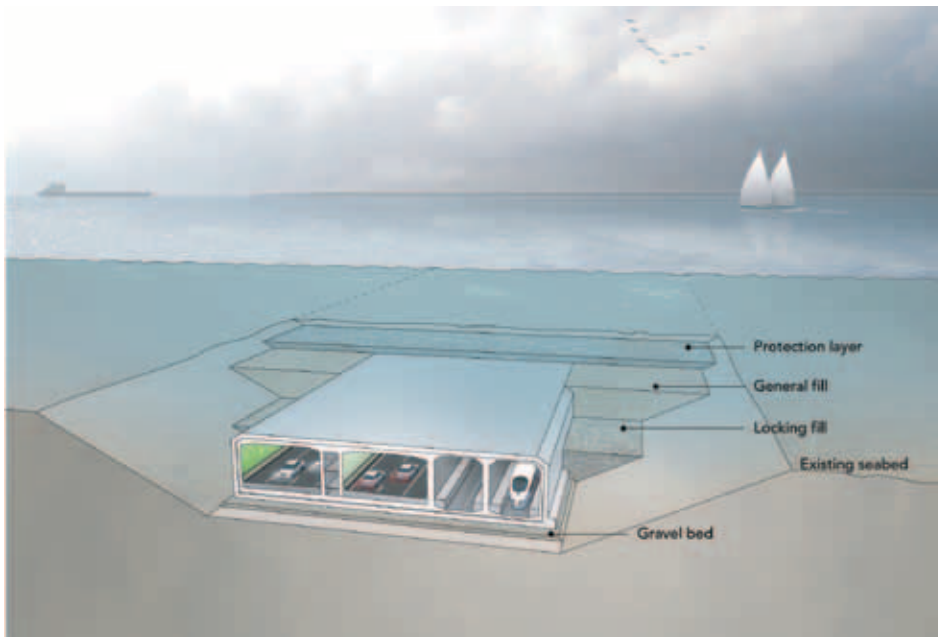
Cross-section of dredged trench with tunnel element and backfilling.
